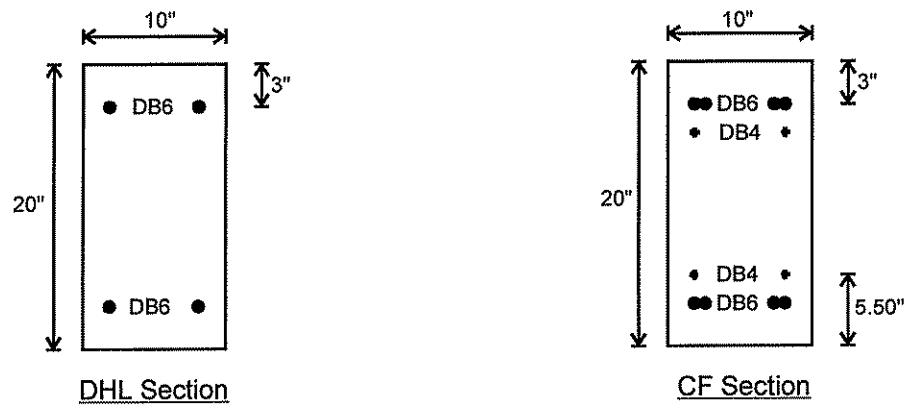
Cross-Sections of Column Sections of MAPT Frame
